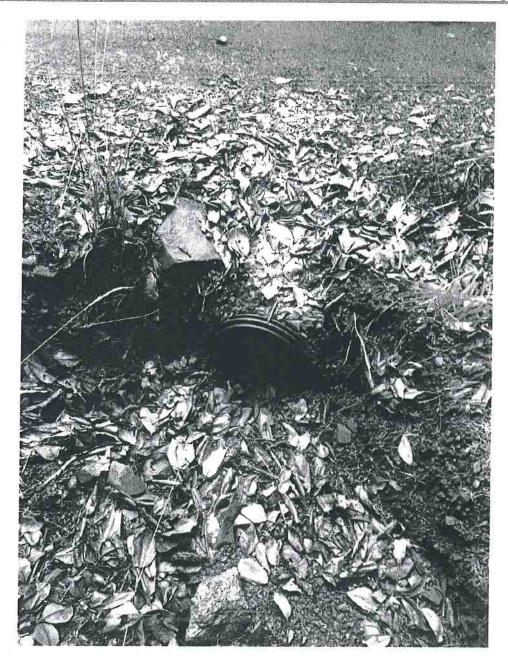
Crossing #1 inlet. Photo date 11-11-16
